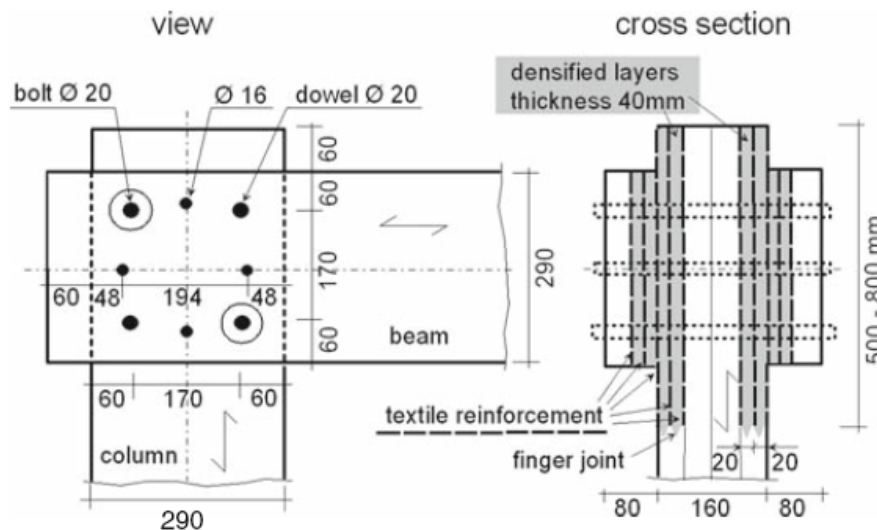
Densified and reinforced beam-column connection [Heiduschke et al., 2008]
